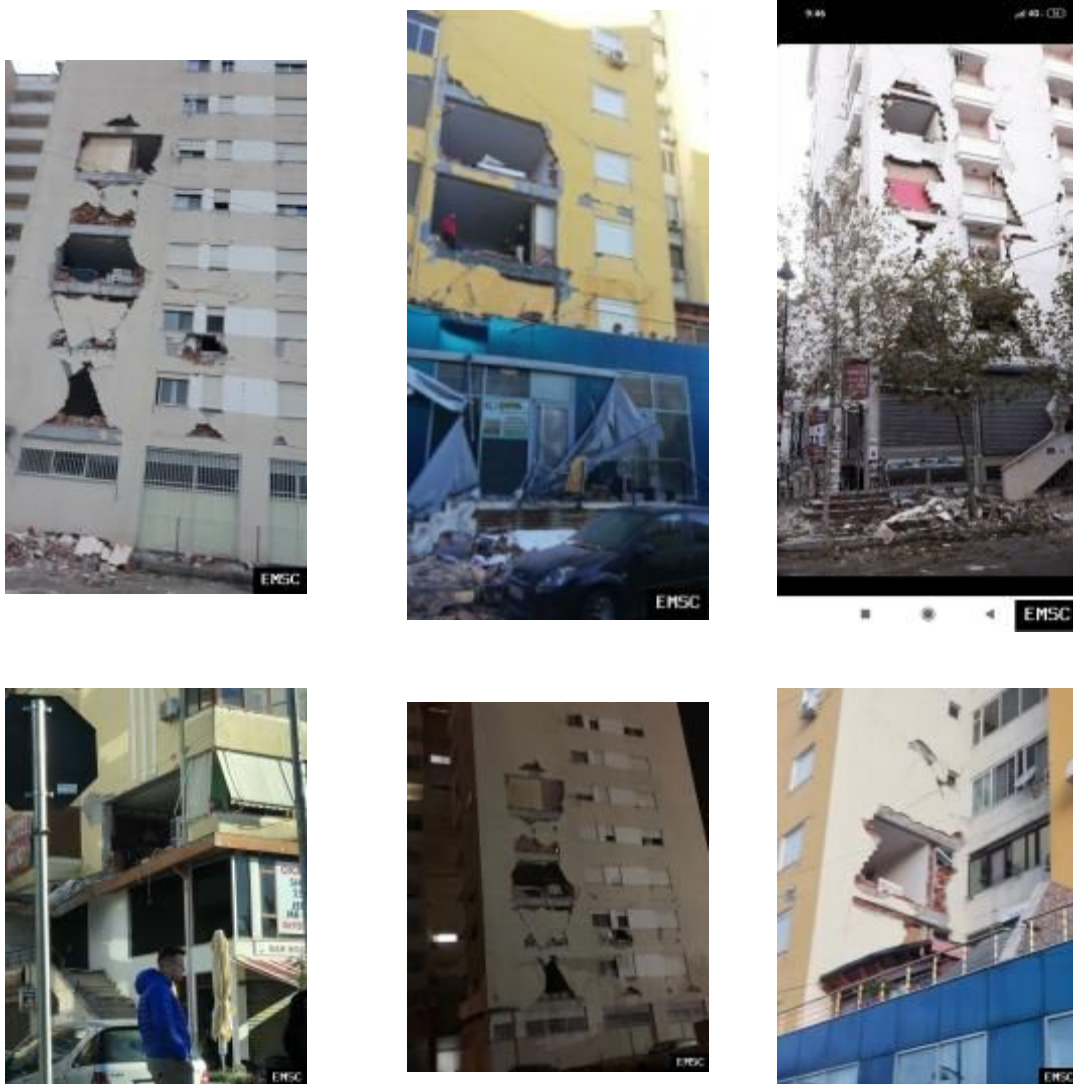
In-plane (IP) / Out-of-Plane (OOP) failures of infill walls (CSEM, 2019)
